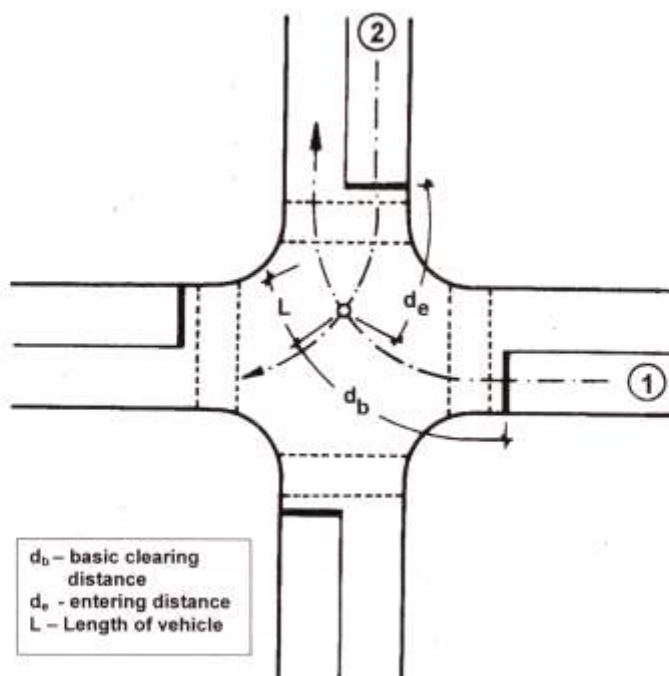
Clearing and Entering Distances for Turning Motorized Vehicles
